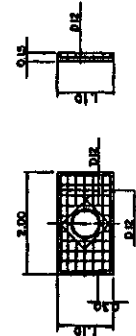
DETAIL OF REINFORCED CONC. BLOCK SCALE 1:20
